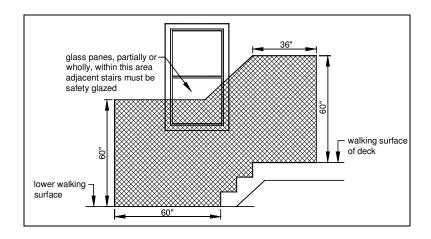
SAFETY GLAZING AREA AT STAIRS
